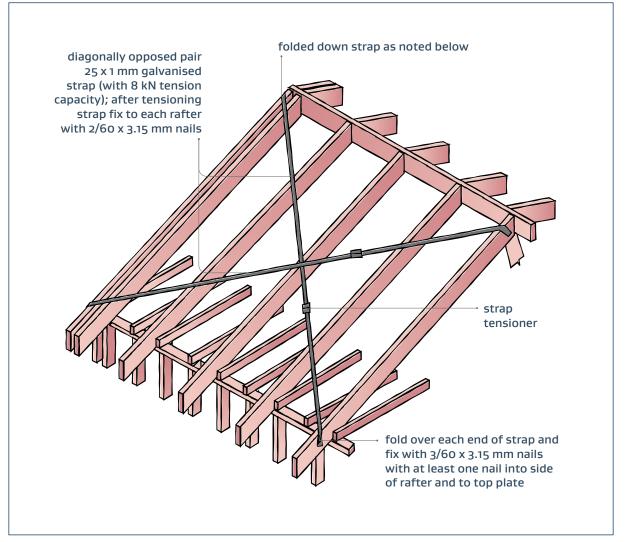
Brace on one side of a gable roof made up of two diagonally opposing continuous steel bracing strips
